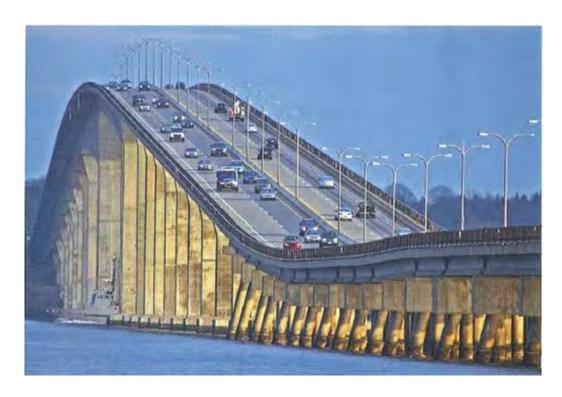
View of the Jamestown Verrazzano Bridge from the West (www.flickr.com)
